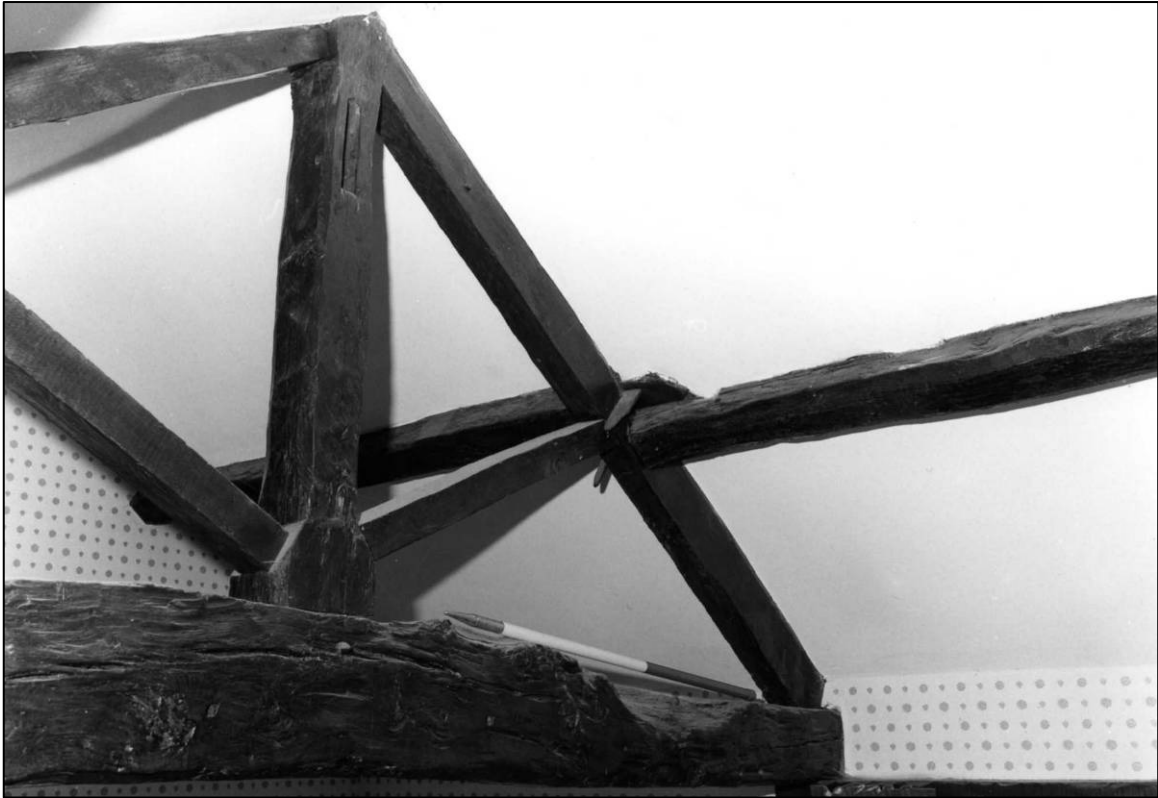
Barn Cottage range, S part, N first floor room (Room 9), truss, looking NE (photo 6/16).
